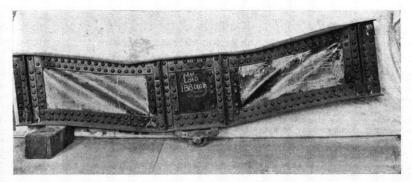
GIRDER 3 AFTER FAILURE
